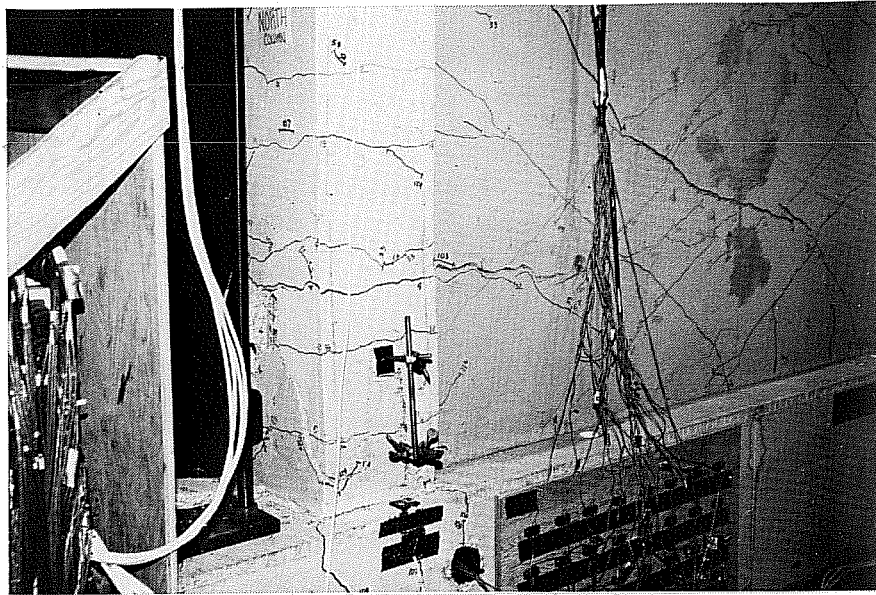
Failures of Splice in Infill Wall (Gaynor)
